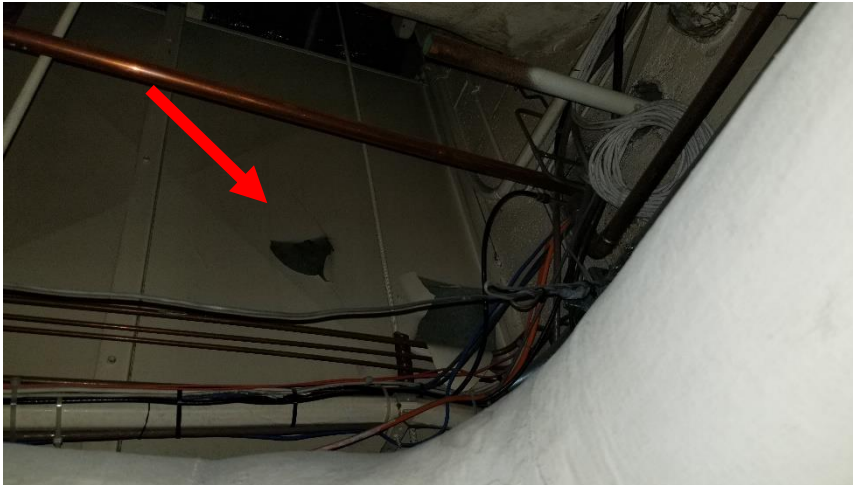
View of the poor condition lead-containing wall paint (Light Beige) observed in Room 01.
